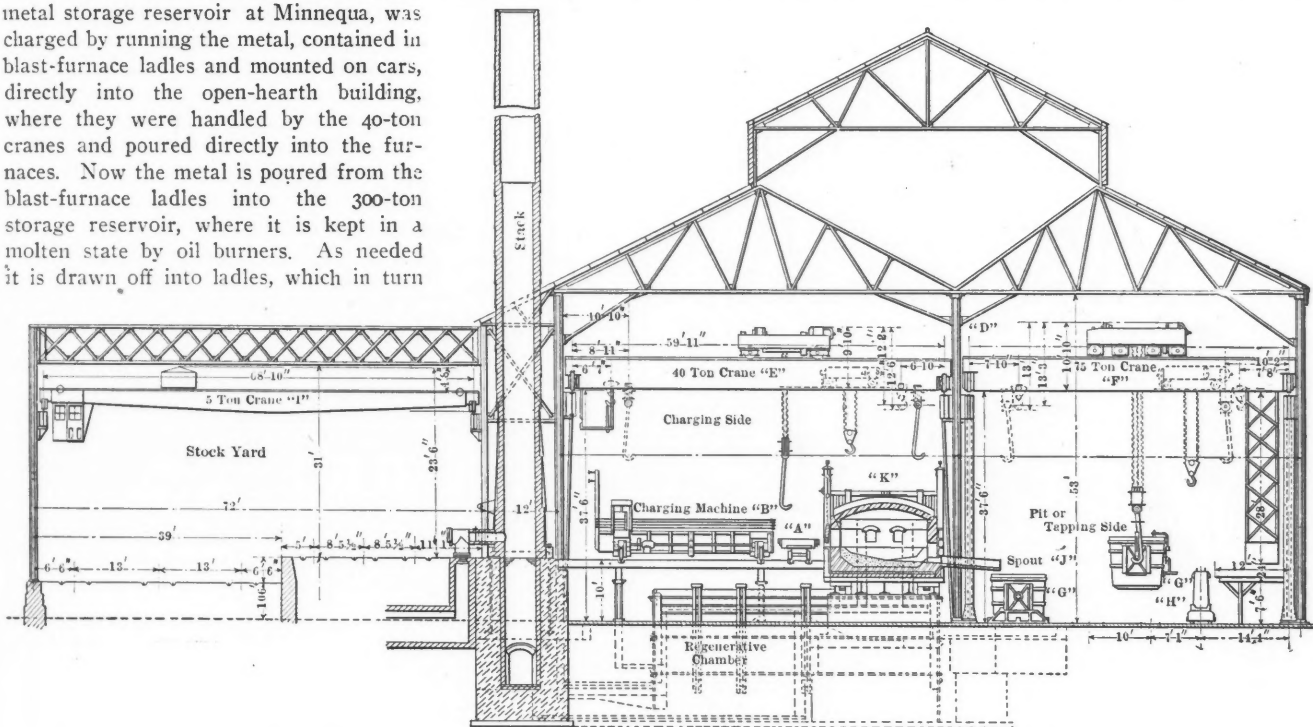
ELEVATION AND CROSS SECTION OF OPEN-HEARTH BUILDING, MINNEQUA WORKS, PUEBLO
